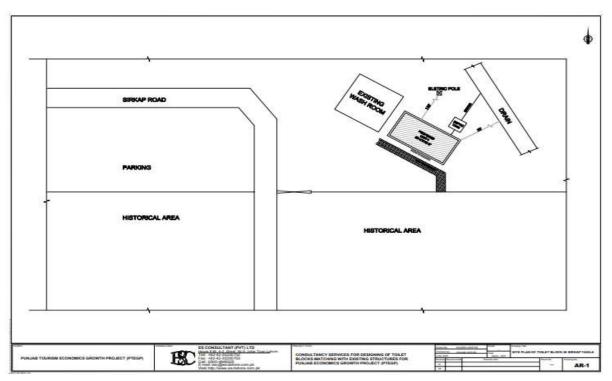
Location of the proposed toilet block at Sirkap Taxila
